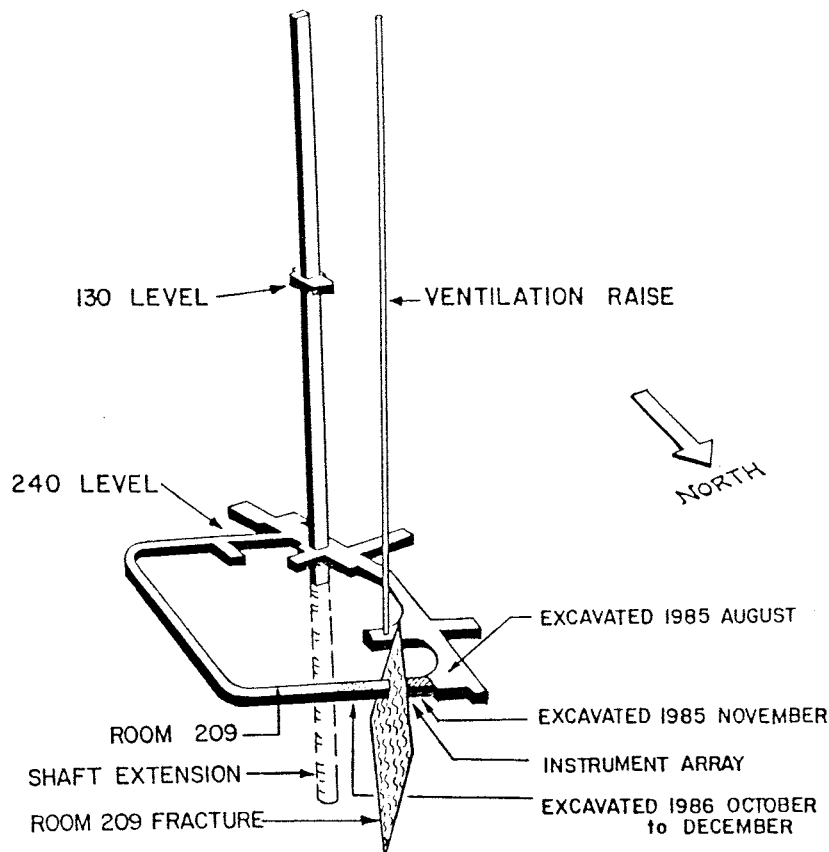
Three-dimensional view of the URL showing the Room 209 extension and fracture.
